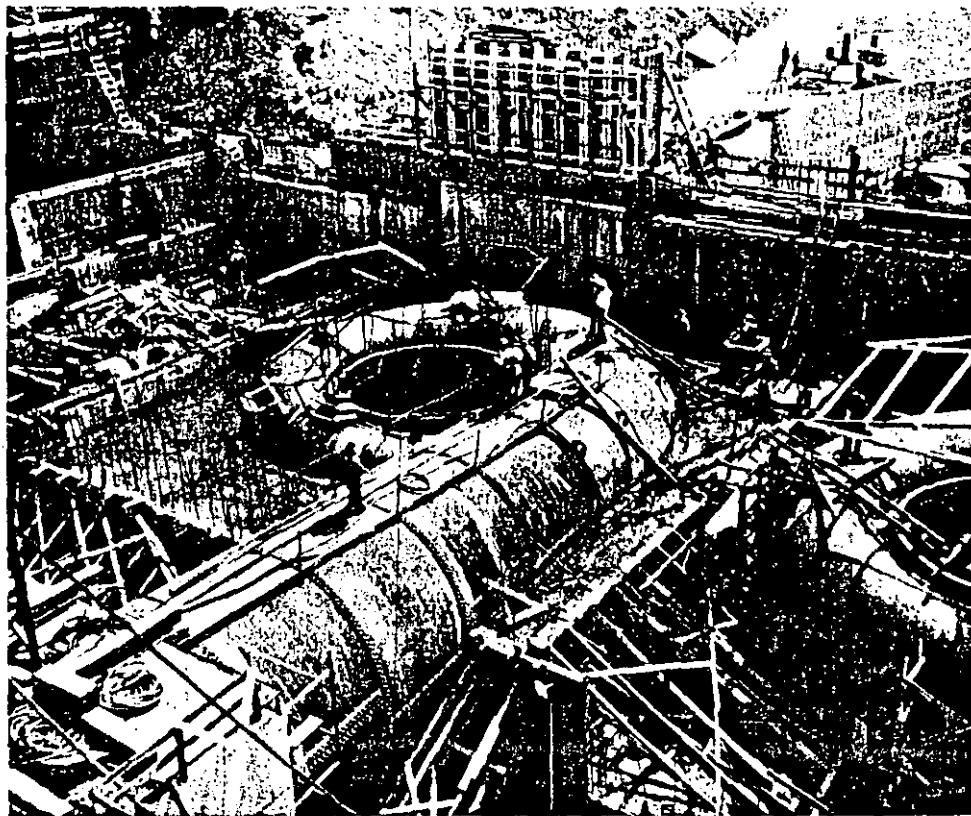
Turbine scroll case at Bull Shoals Dam powerhouse at completion of the first (10 ft) lift of PA concrete. A second lift completed the embedment
